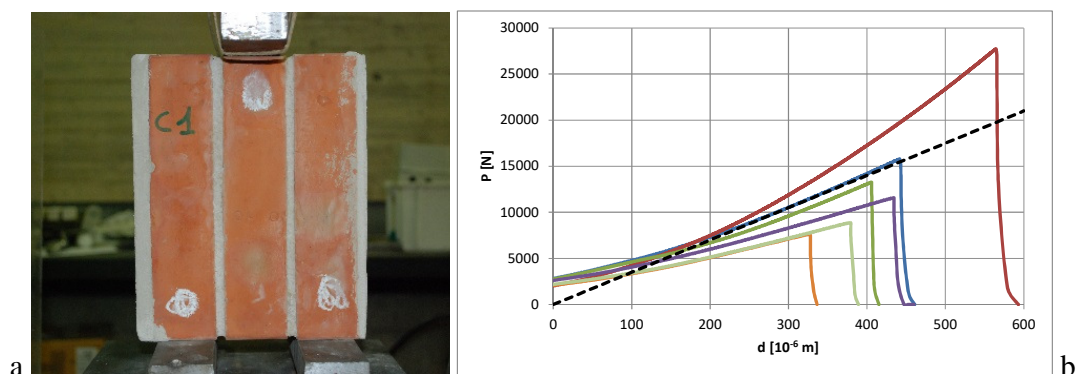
Shear tests on masonry small specimen (triplet) without precompression. Laboratory test configuration (a) and load-slip curves (b).
